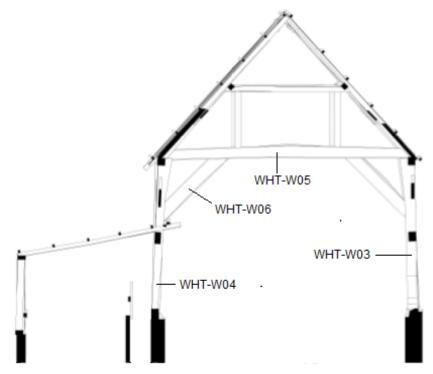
Section through Truss 2, east face, showing the sampled timbers, WHT-W03-06 (after ATD London Ltd)
